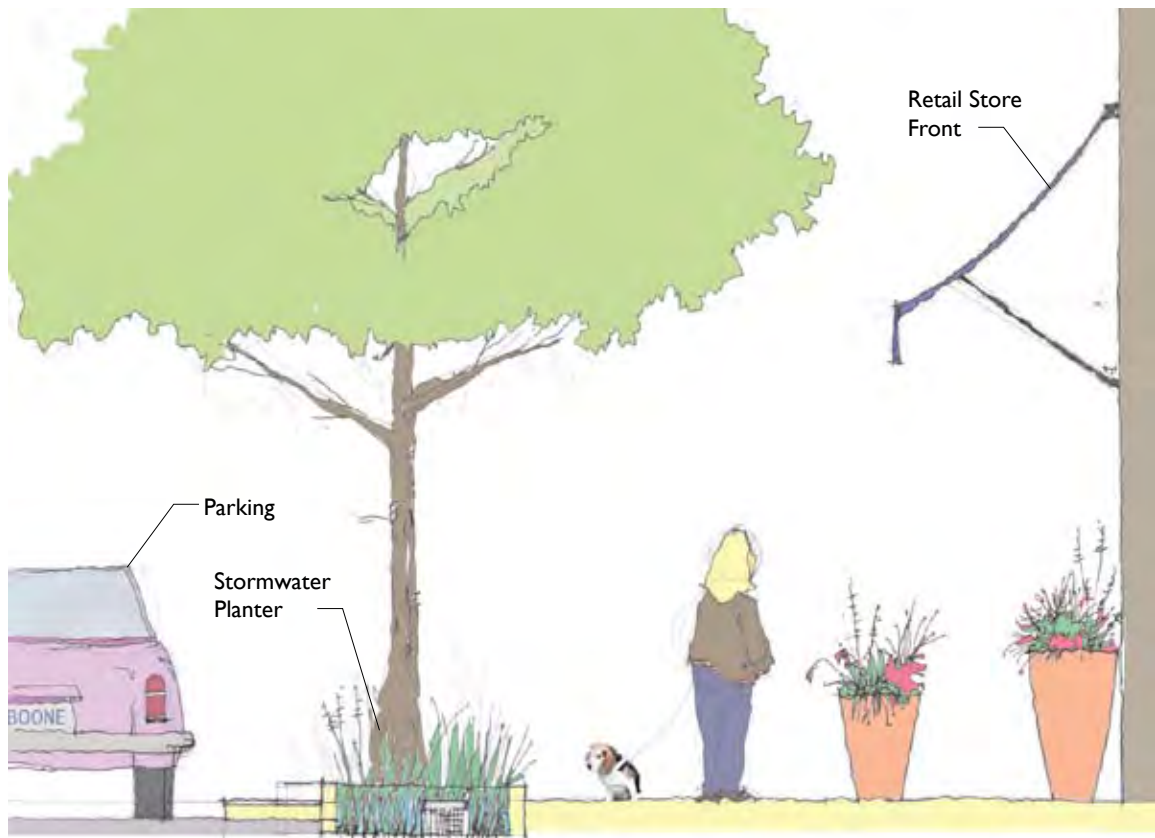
Parking, Stormwater Planter, and Sidewalk at Retail Store Front
